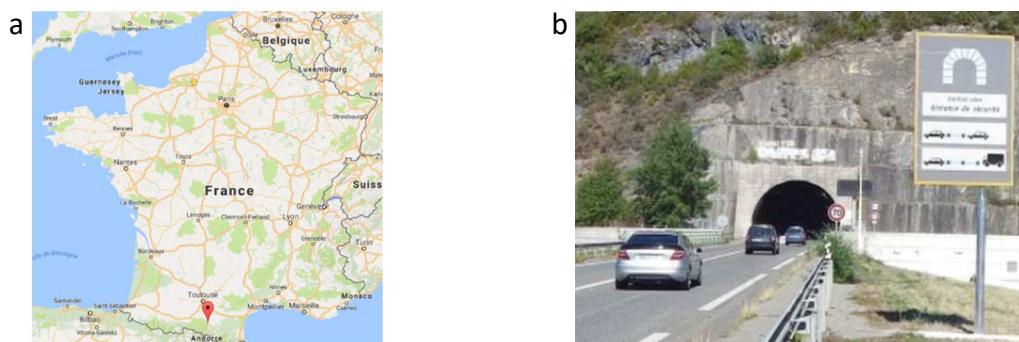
(a) location of the Foix tunnel (source Google); (b) piloted sign installed at the tunnel entrance (photo CETU)
